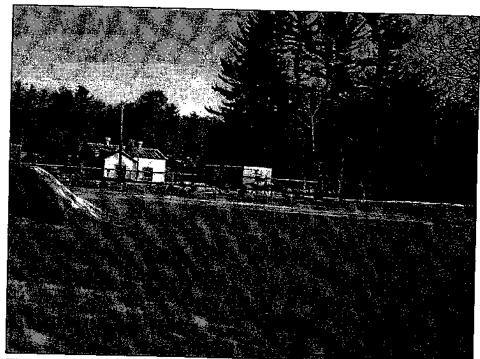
View of existing Laconia Meter Station and proposed additional temporary workspace (foreground), view facing northwest.
